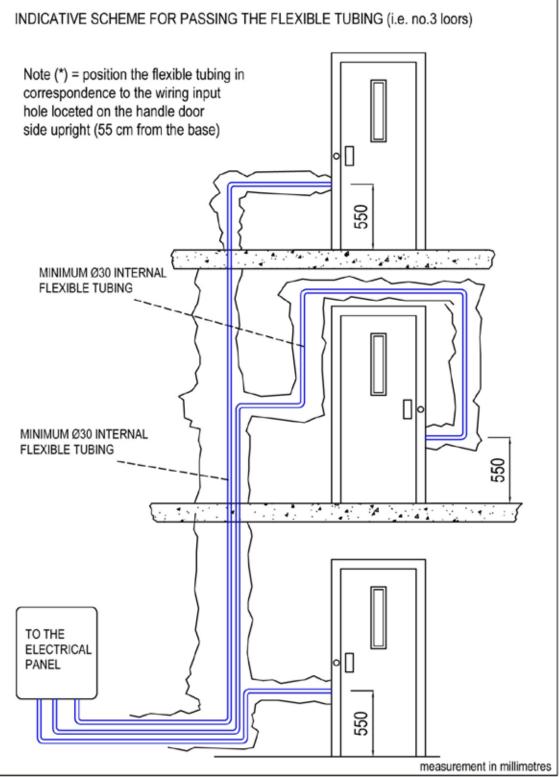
Passing the flexible tubing for the door's electrical fittings
